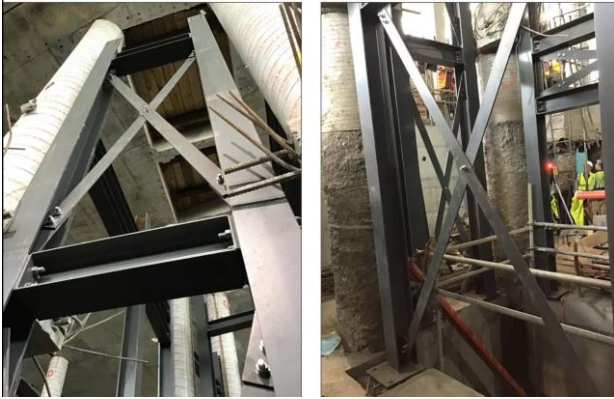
Images showing steel braced cores installed between temporary pile-columns.
